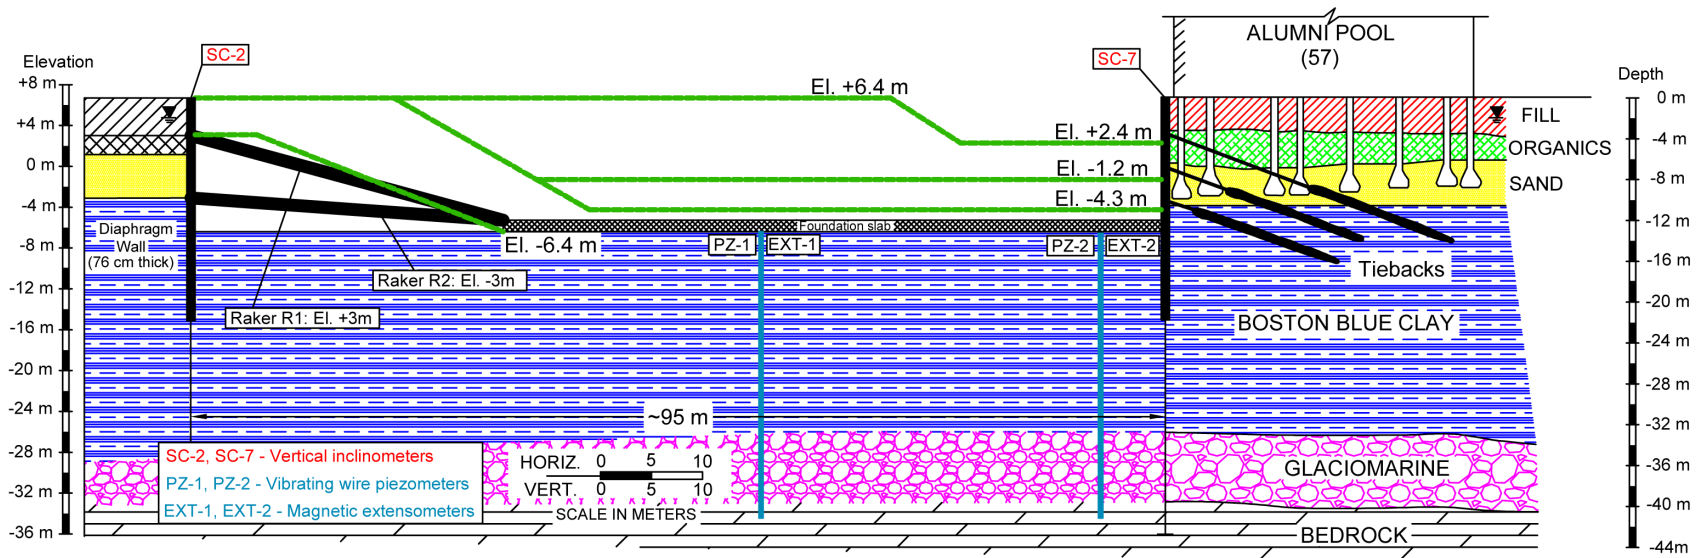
Typical N-S cross-section for Stata basement excavations showing support systems, soil profile and foundations of Alumni Pool (Building 57)
